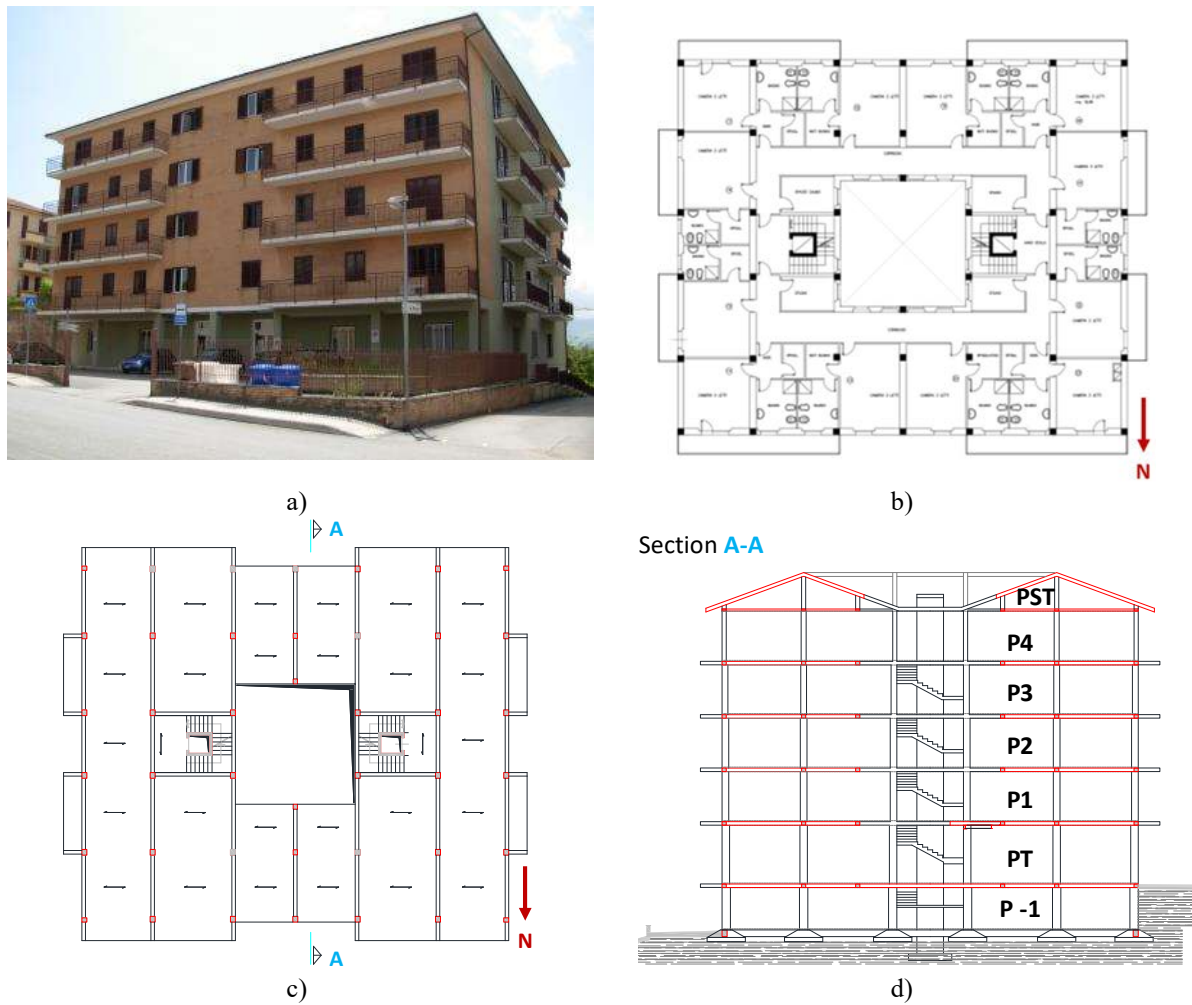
a) picture of the Fazzini college before 2016; b) architectural layout of the building; c) structural layout of a floor type; d) structural section of the building.
